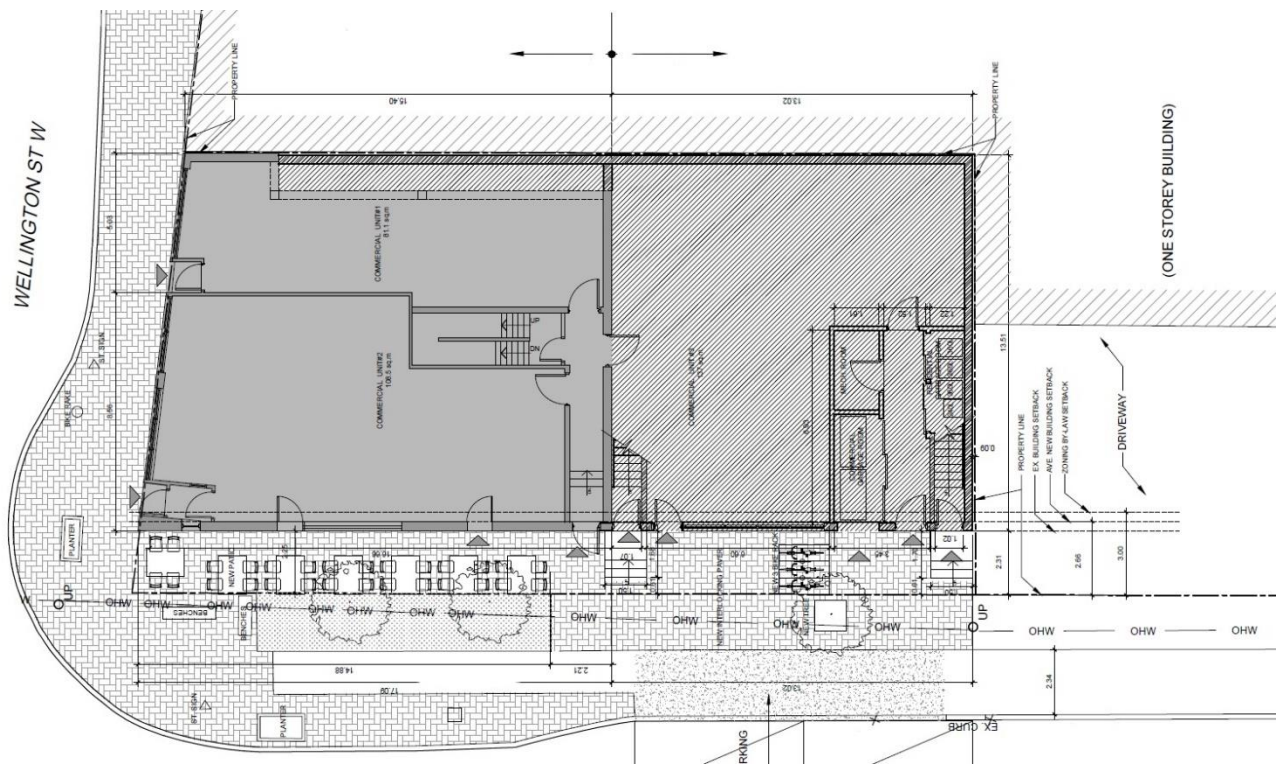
Site Plan for the 1248-1252 Wellington Street West
